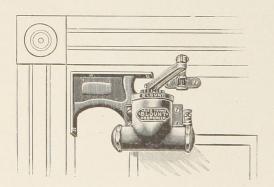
Left-hand Door From Outside Use Right-hand Check Corner Bracket, additional (see page 185)
